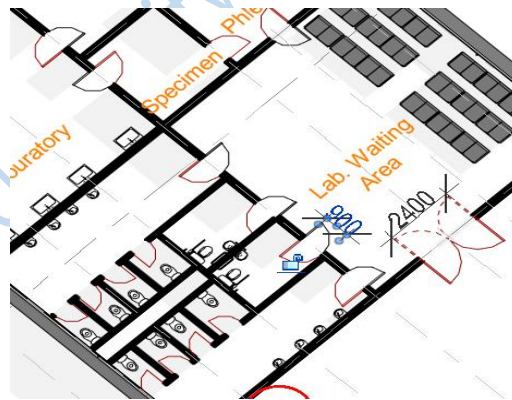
Part of Floor Plan Showing Accessible Spaces and Toilets
